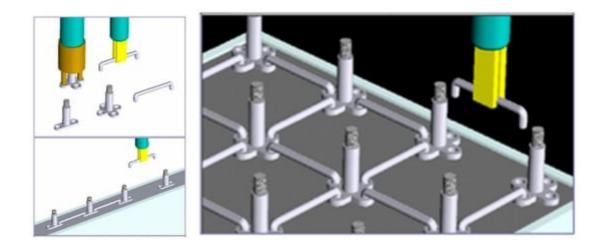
Steel elements reinforcement for printed concrete developed by Khoshnevis [28].
